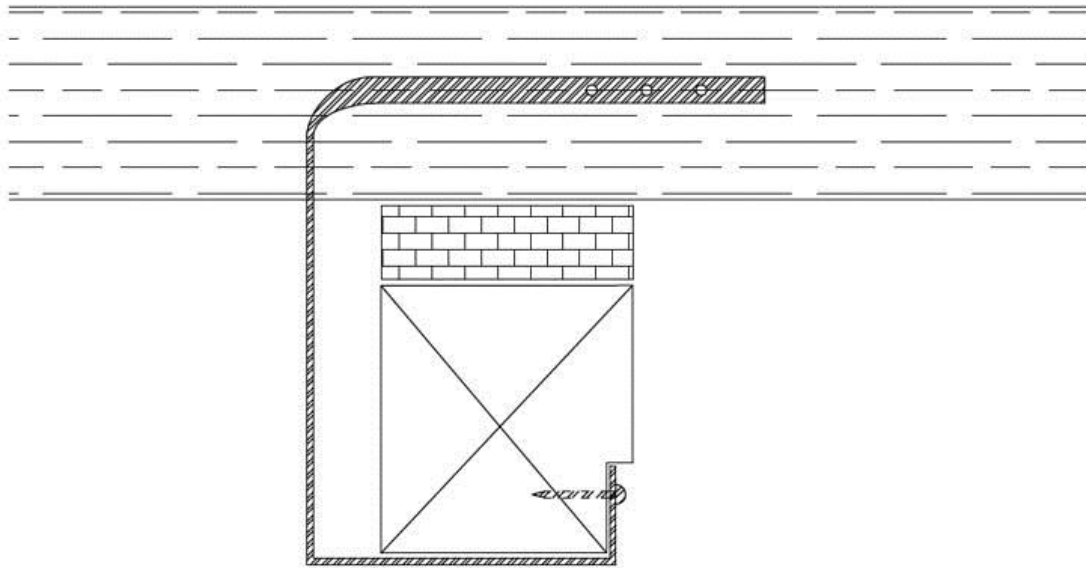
Illustration of anchorage of the upper secondary beam to the lower primary beam with brick in between.
